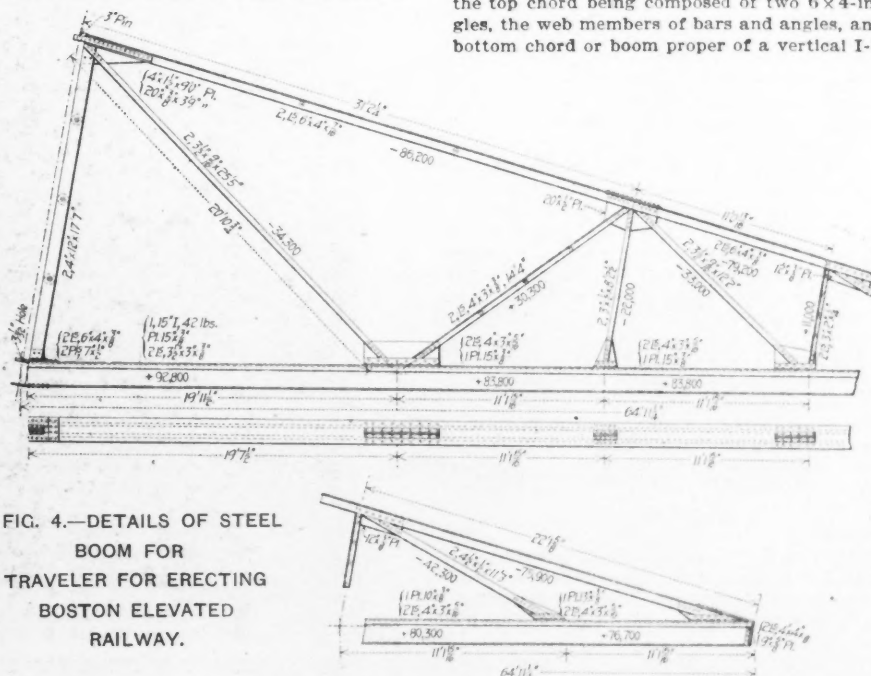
DETAILS OF STEEL BOOM FOR TRAVELER FOR ERECTING BOSTON ELEVATED RAILWAY.
